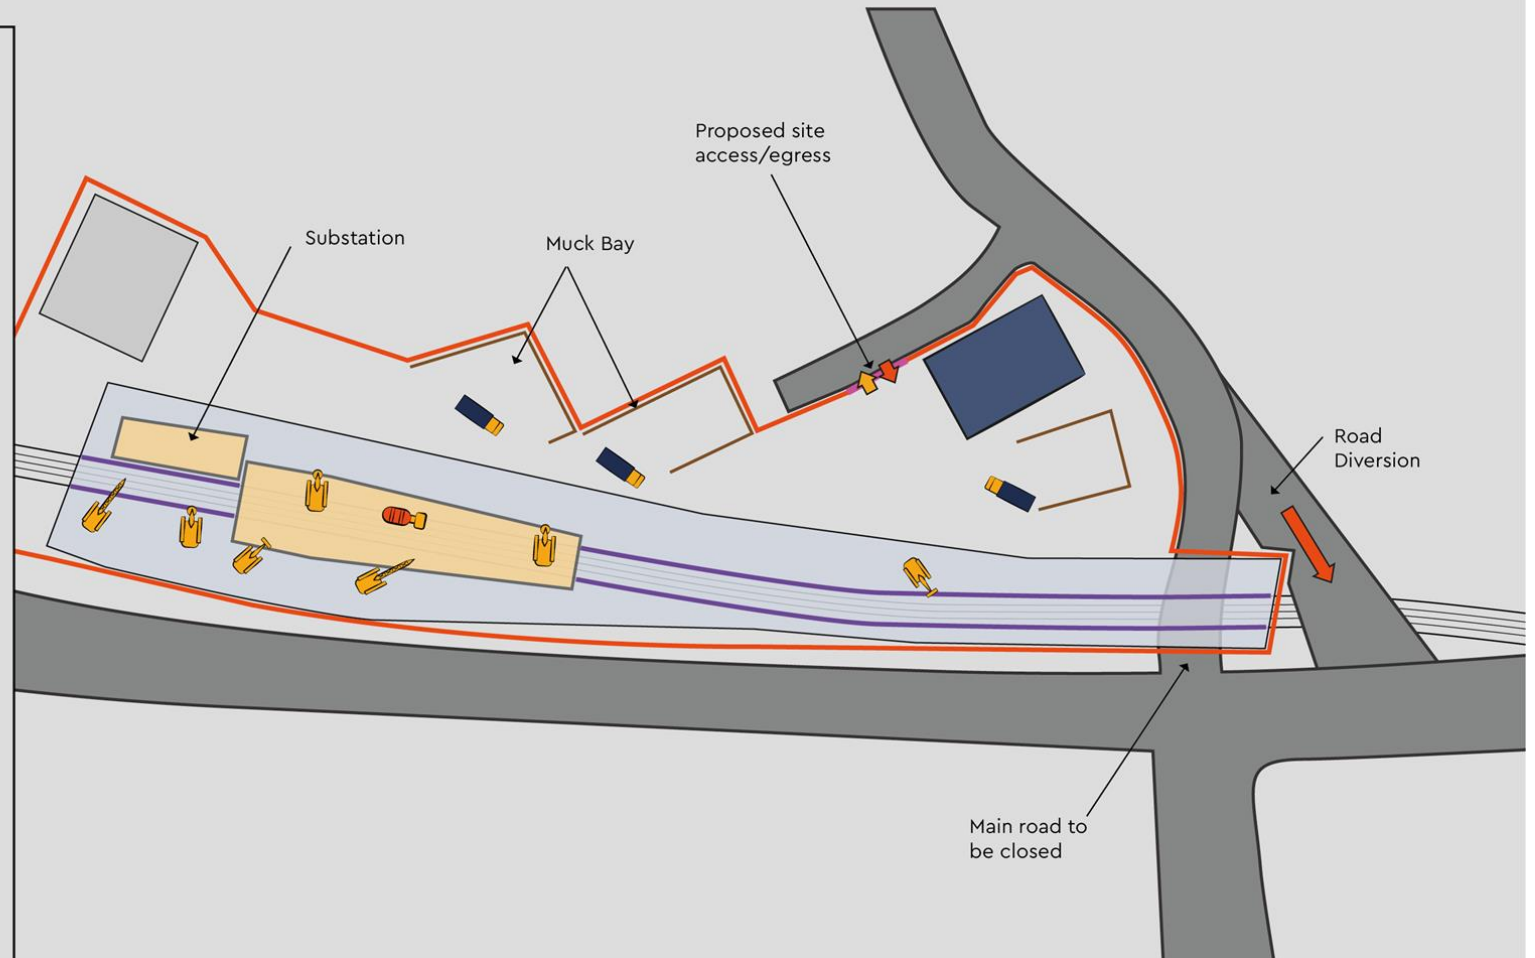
Fosterstown Station Stage 2 - Piling Works
